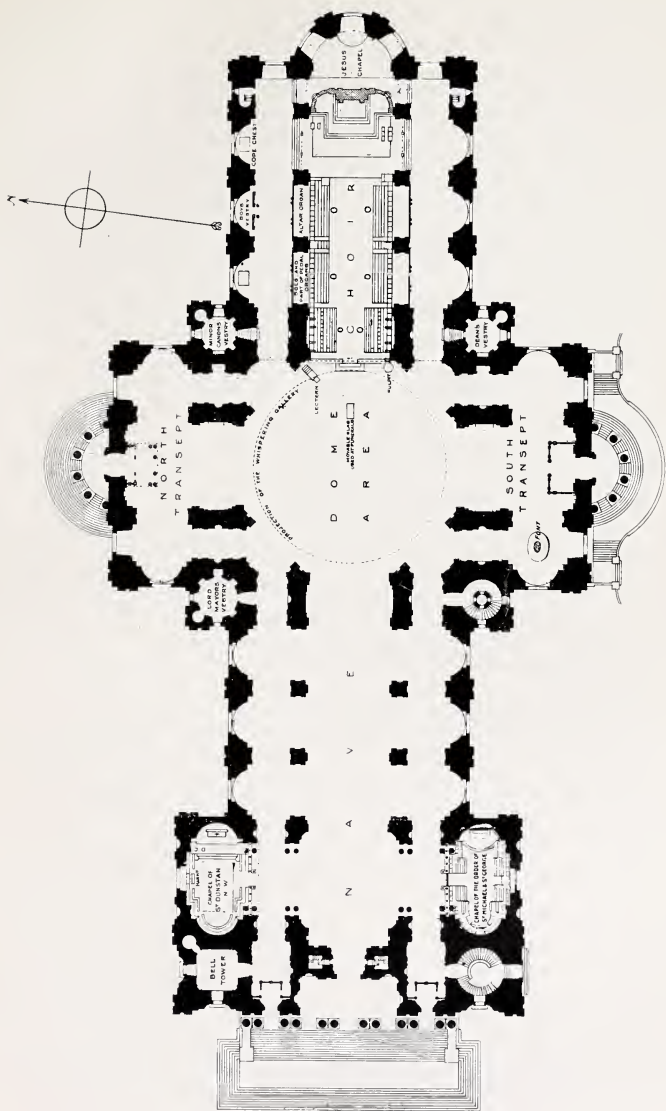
GROUND-PLAN OF ST. PAUL'S
